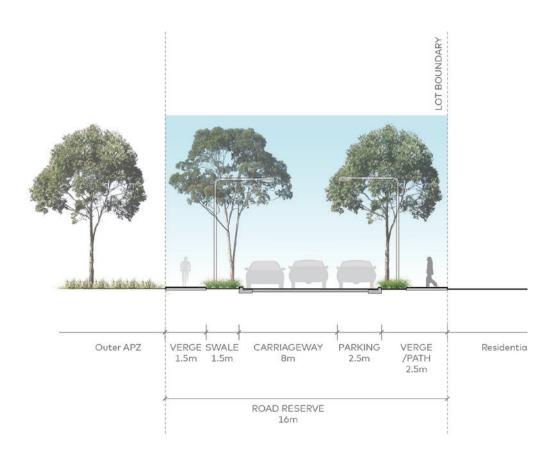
Typical 16m Local Street Section with an Interface to an APZ Buffer (Source: COX Architecture)
